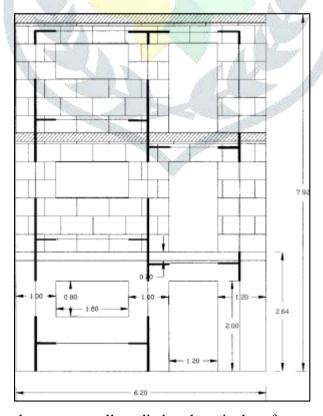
Geometry of perforated masonry wall studied and equivalent frame model with full horizontal and vertical offsets
